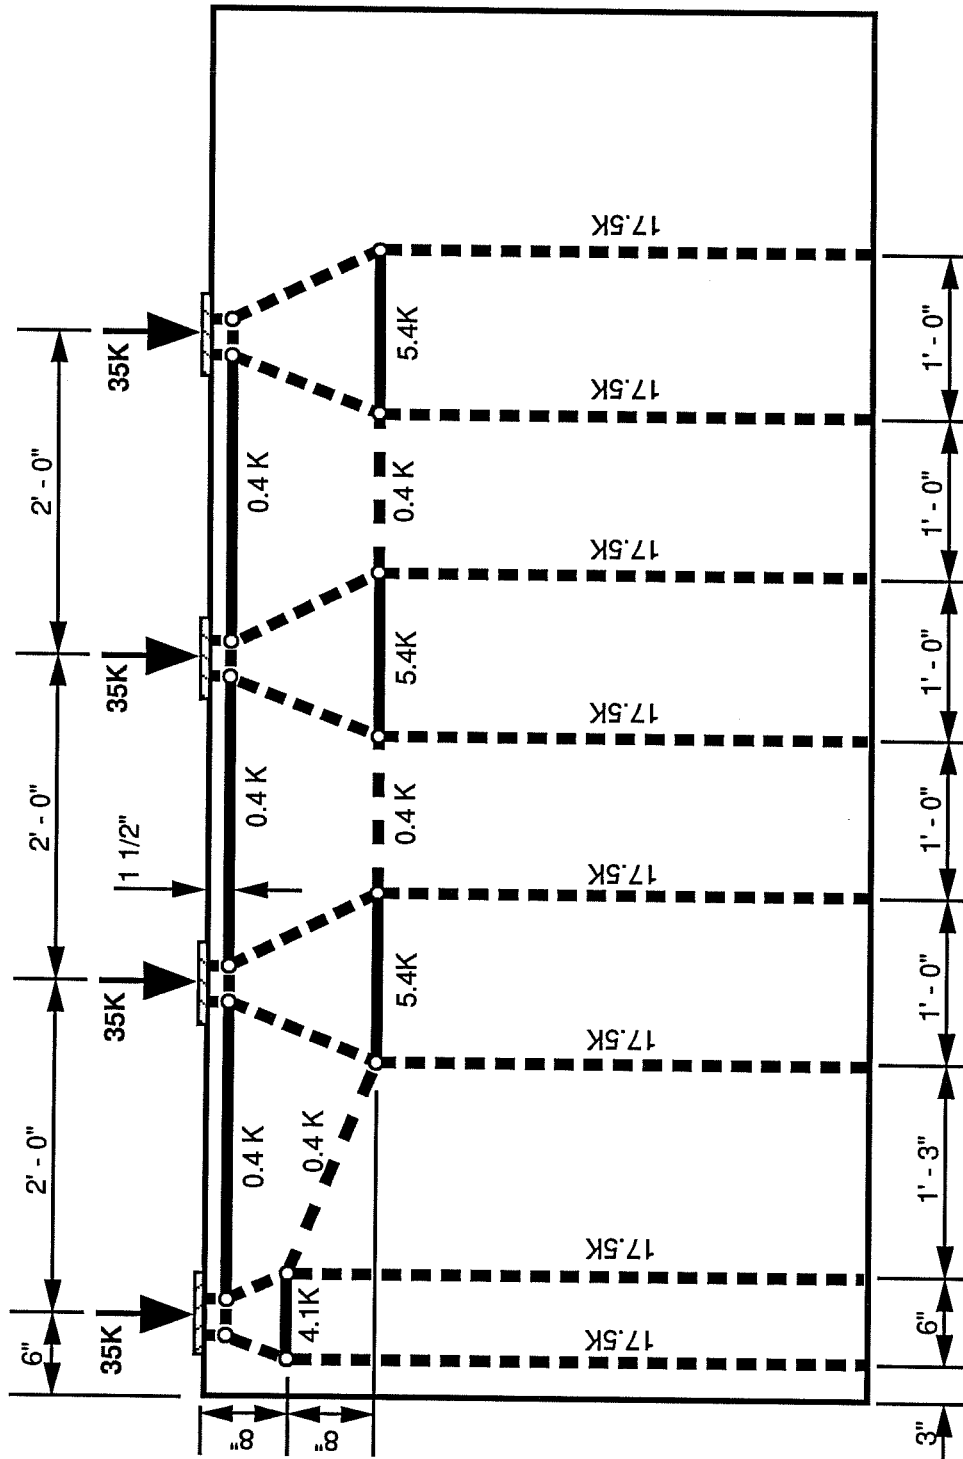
Horizontal Plane Strut-and-Tie Model for Load on an Alternate Anchors
